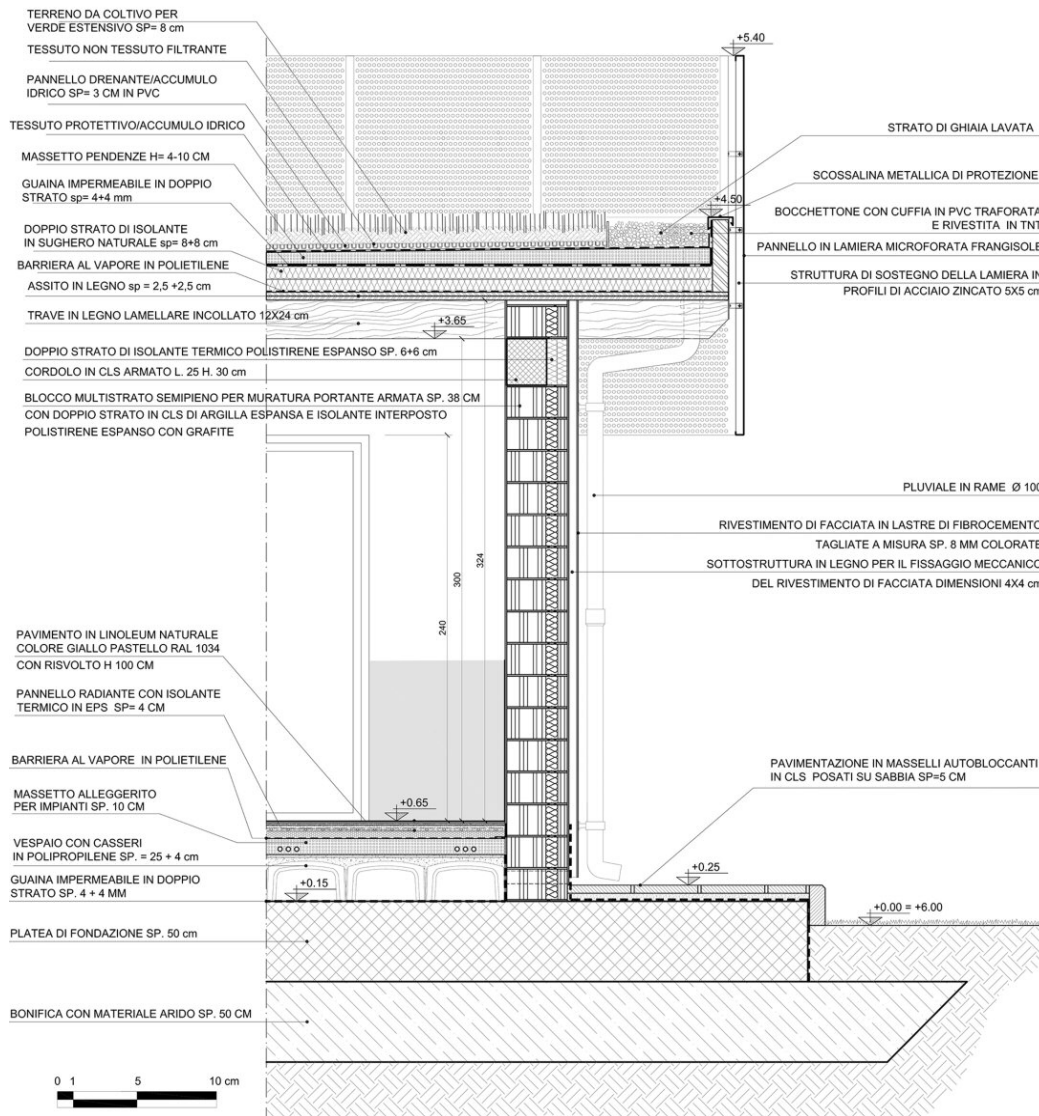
Technological section of the kindergarten building with load-bearing masonry and disassemblable glulam roof, showing the ventilated façade solution (credit: P. Altamura, 2017).
